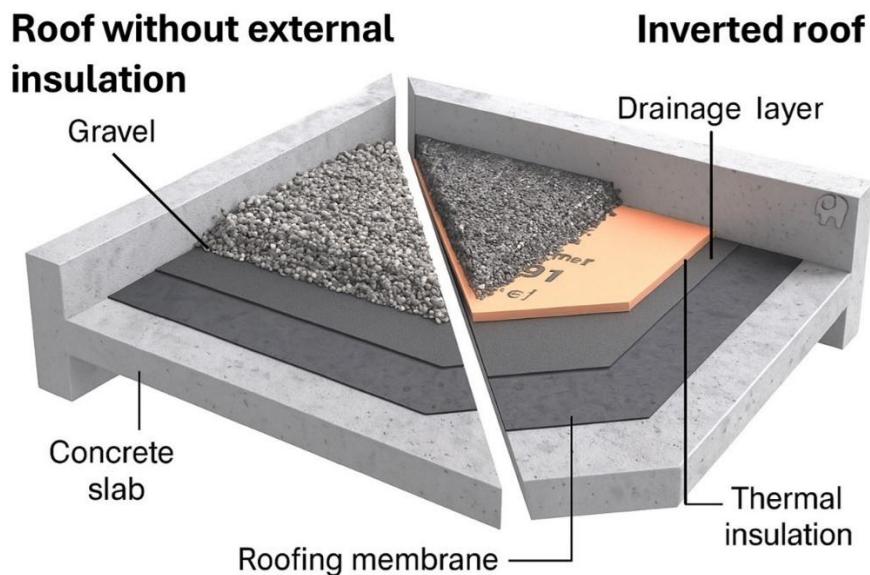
Inverted roof concept, with the addition of extruded polystyrene (XPS) insulation board at Central Building (Building B).
